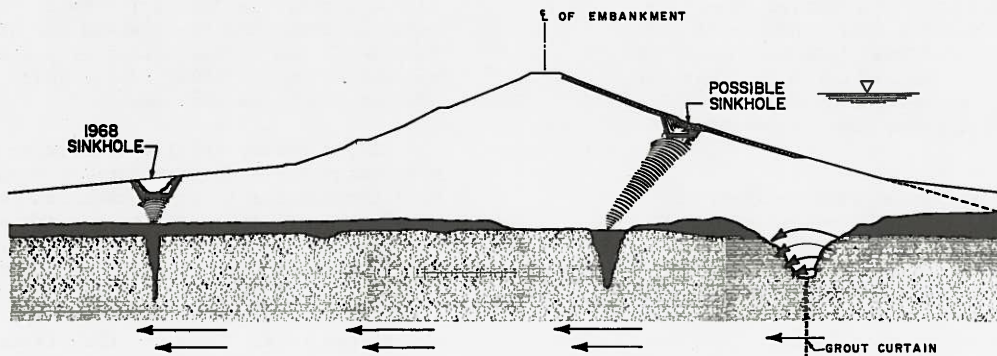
DEVELOPMENT OF PIPING AND SINKHOLES IN AN EARTH DAM ON LIMESTONE FOUNDATION.
